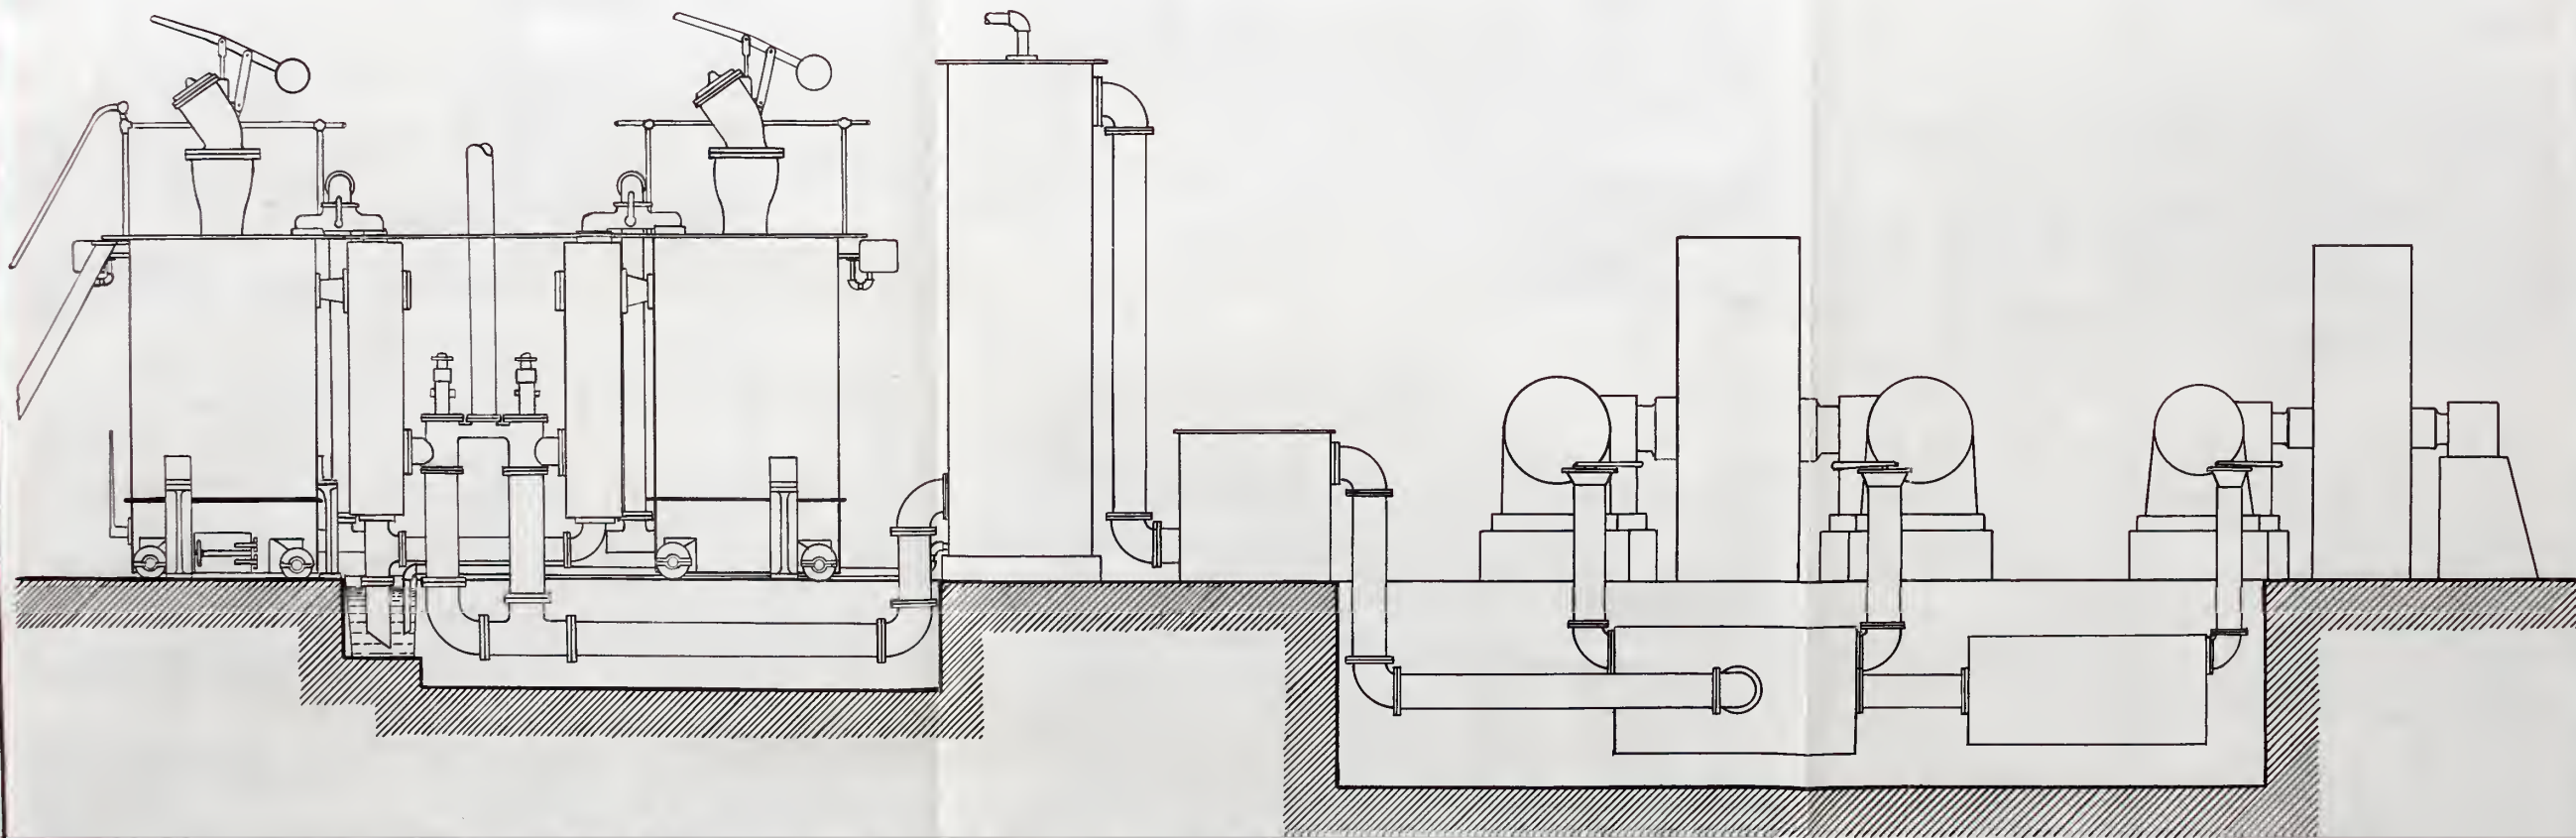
ELEVATION OF PROPOSED BUILDING —
